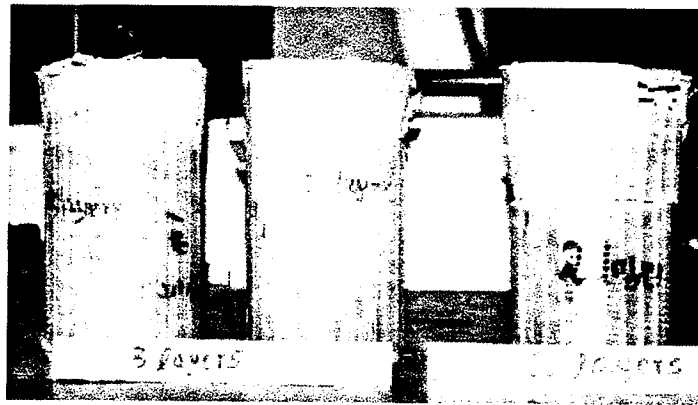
Failed Concrete Cylinders (2 and 3 Layers of Wrap)
